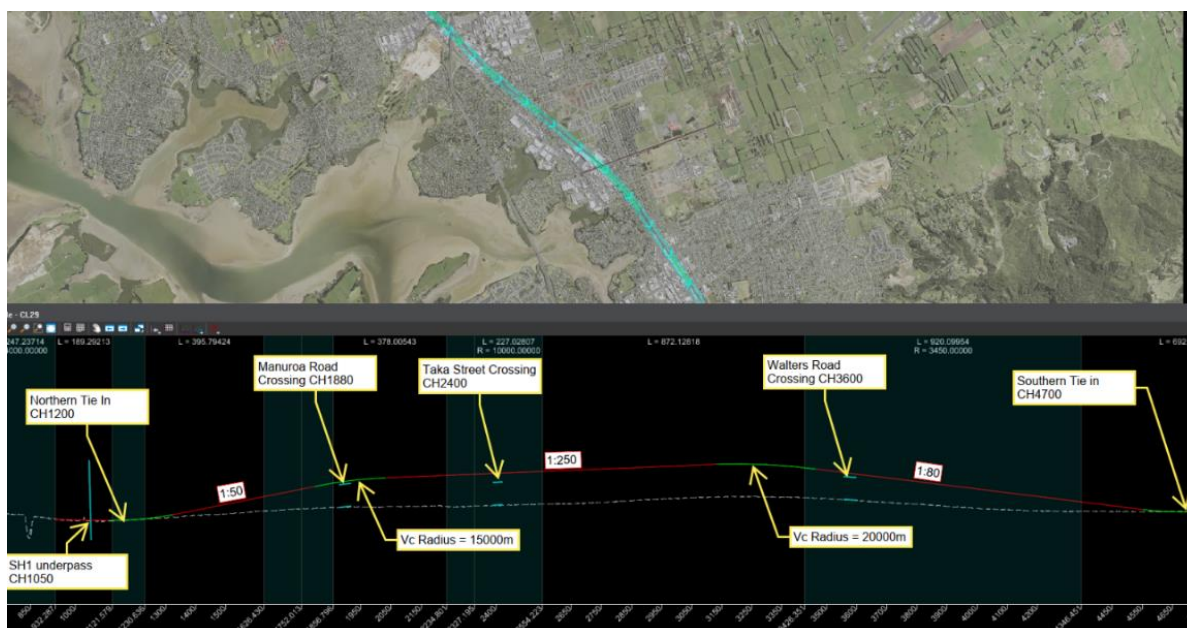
Longitudinal section and plan view for rail-over-road viaduct option
